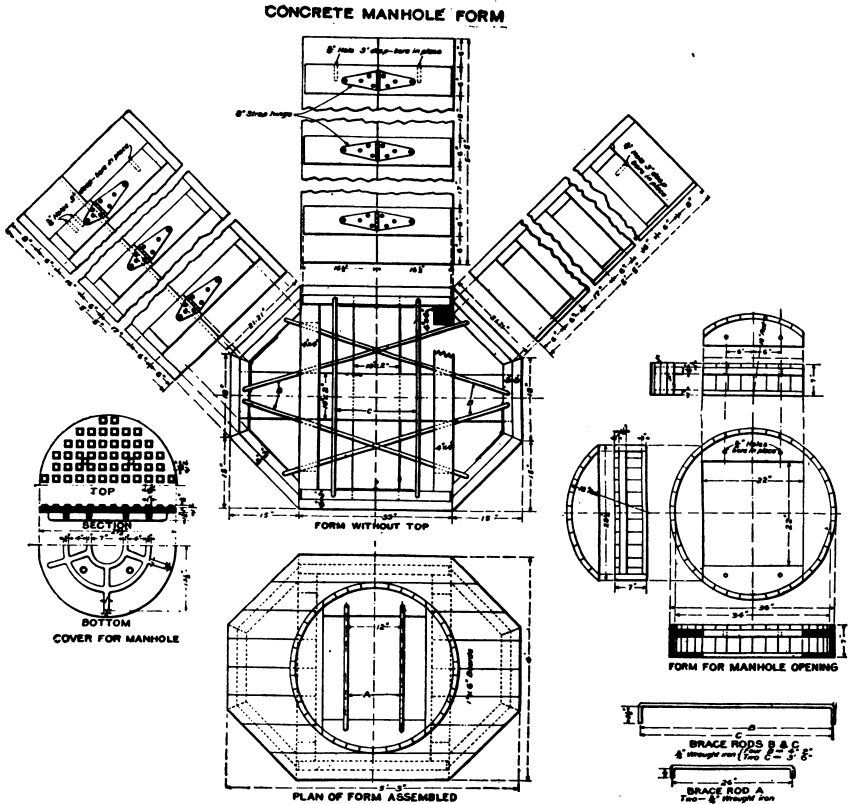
CABLE SYSTEM, MANHOLE, REMOVABLE FORMS.
